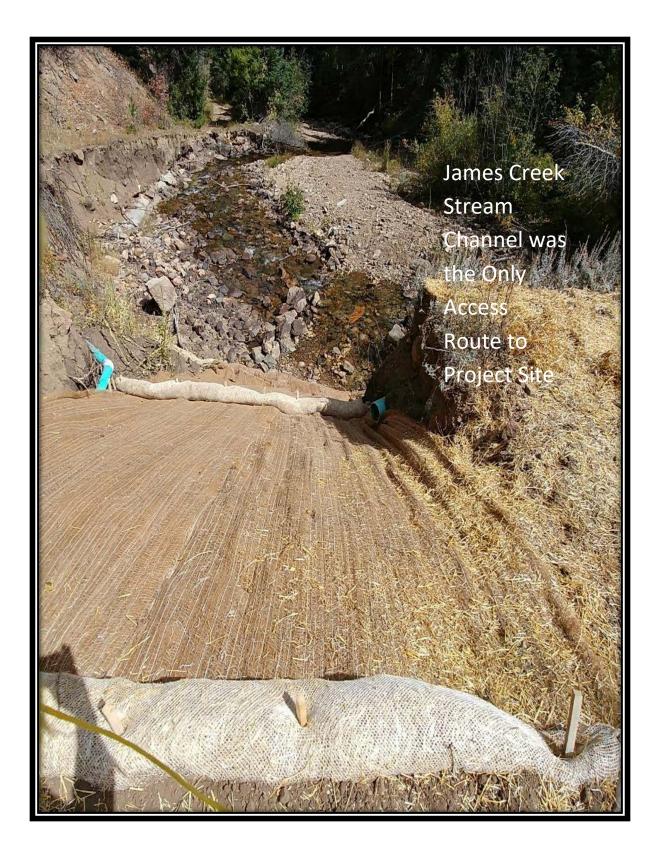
Reclaimed Access Ramp into James Creek (The Remains of the County Road can be Seen in the Upper Left Part of the Photo)
